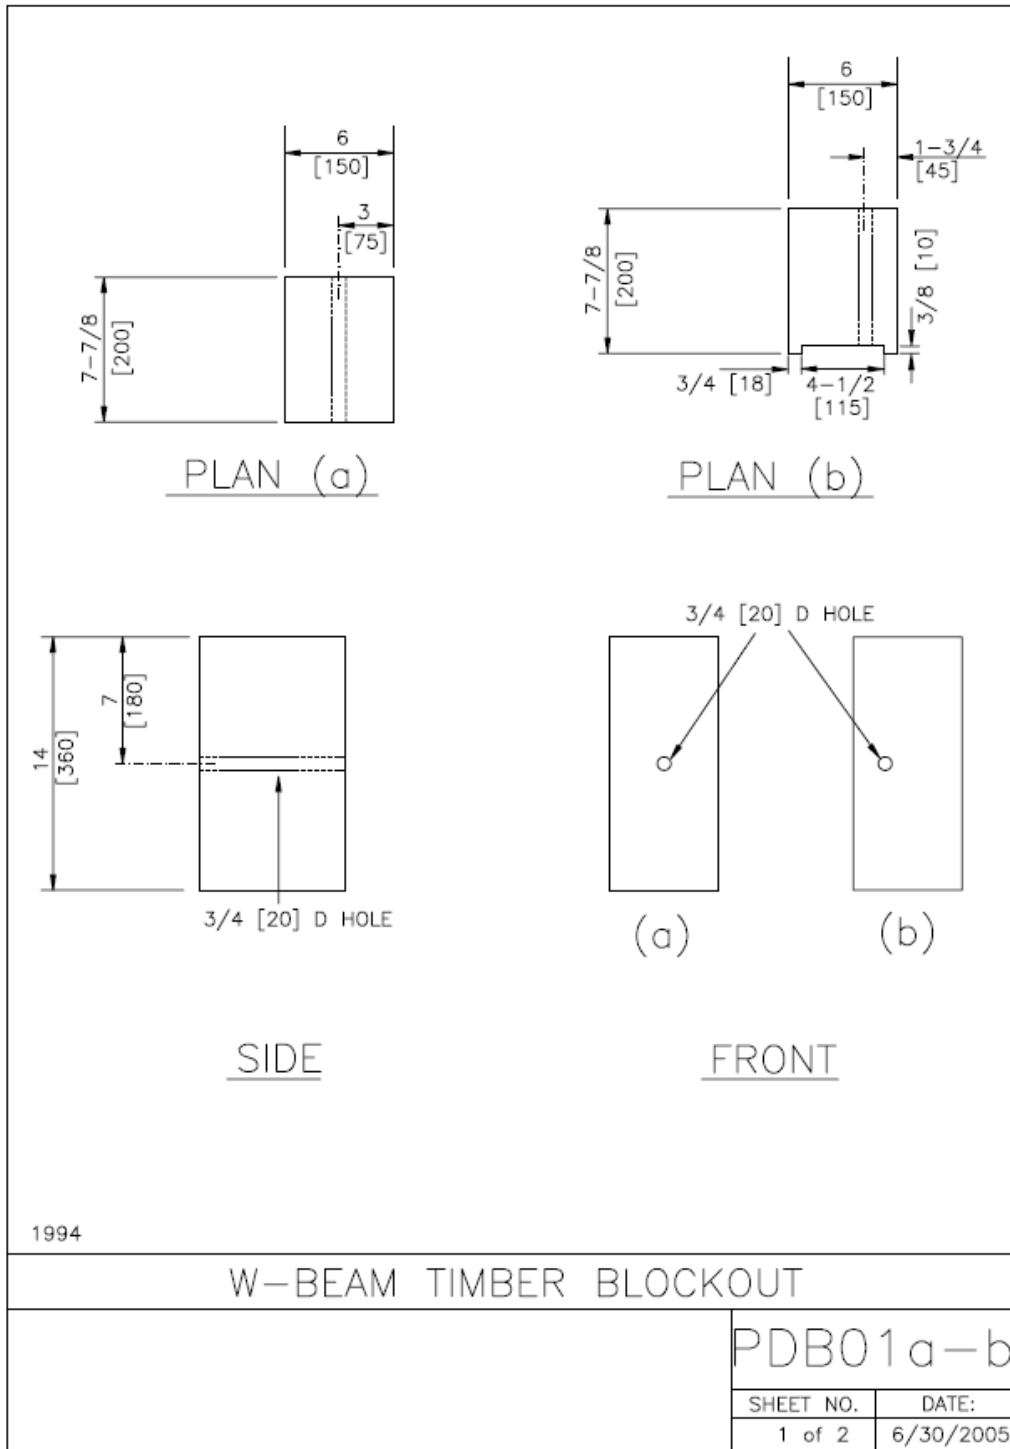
Drawing of the 8-inch wood blockout for the modified G4(1S) with wood blockout guardrail (PDB01b).
